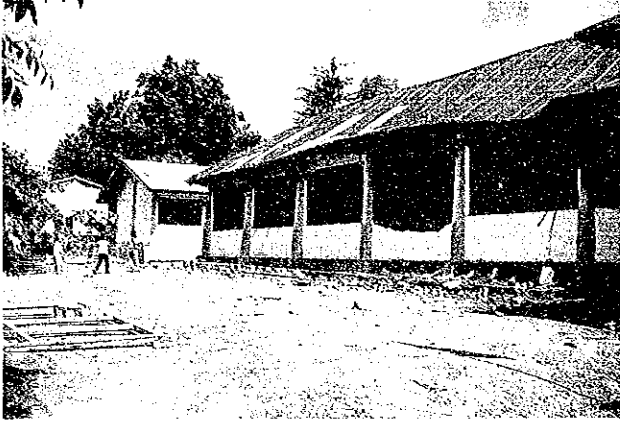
Severely Damaged Elementary School Building, Roof; Timber; Masonry, Column; Reinforce Concrete
